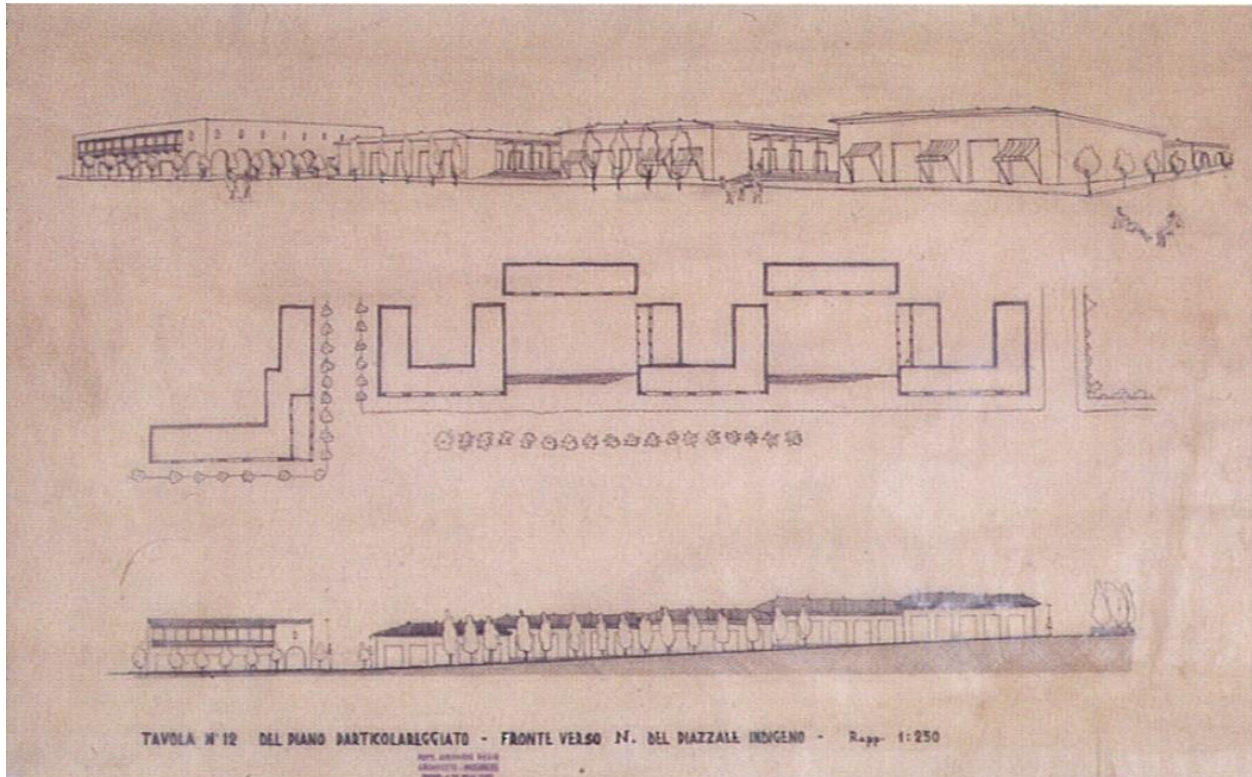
G. Bosio, general town plan of Gondar, details and profiles of the buildings in the new native centre (APEGB).
